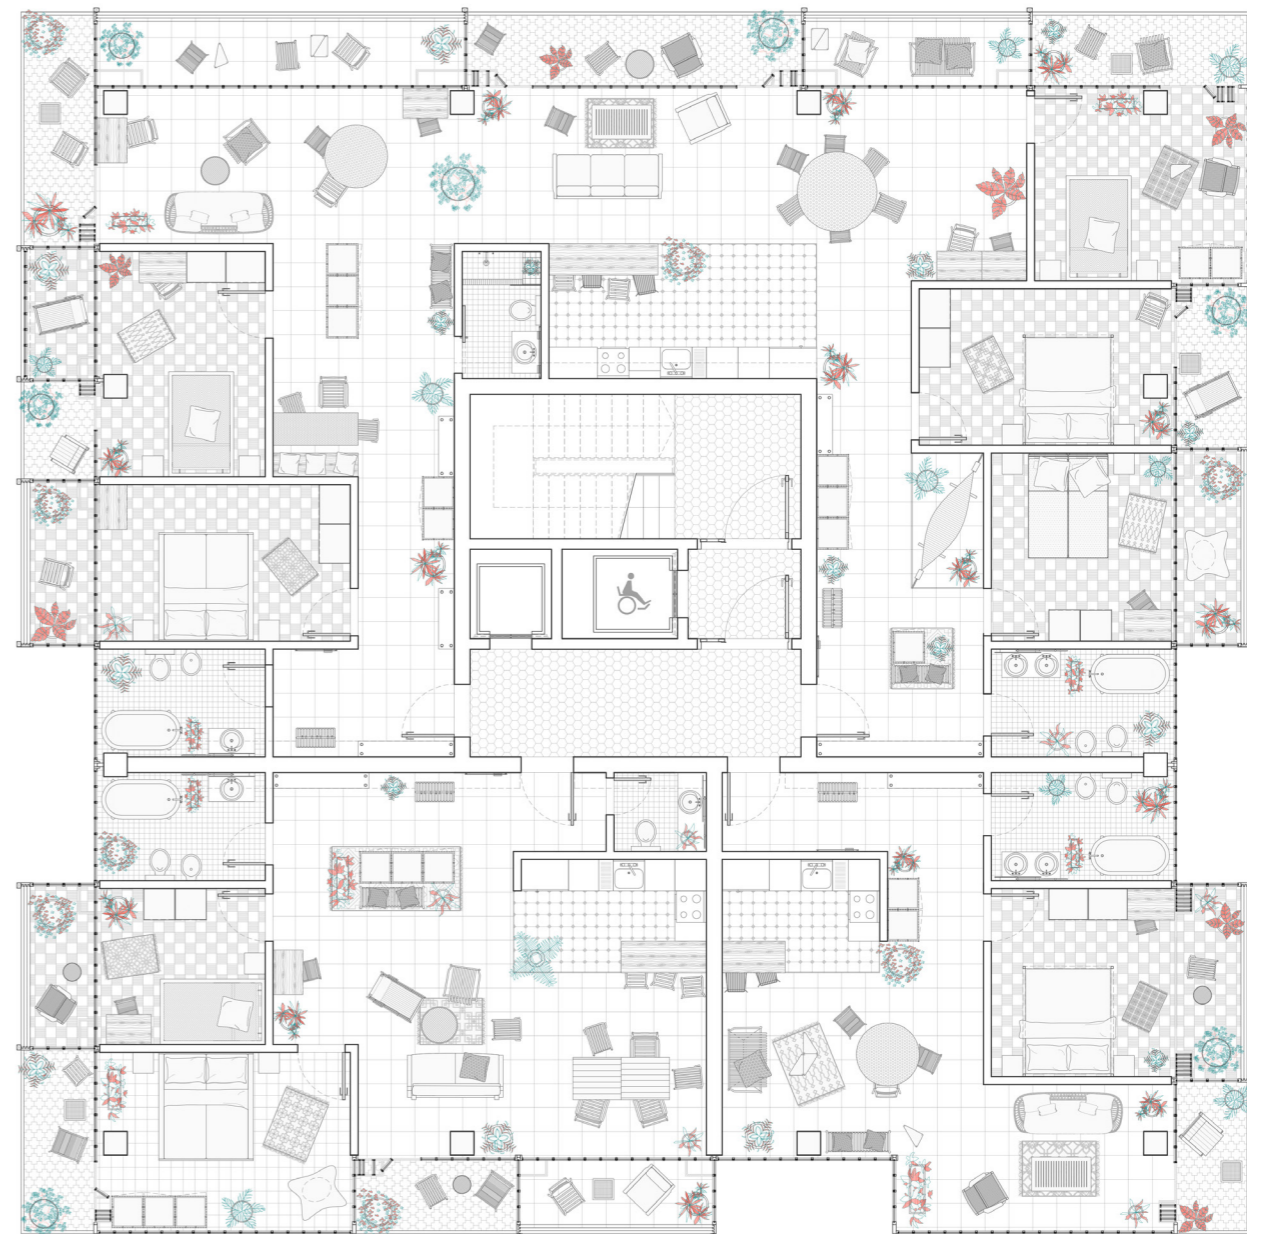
Type 3 - Dwelling Units Floor Plan, variation 2 (levels 14-15)
